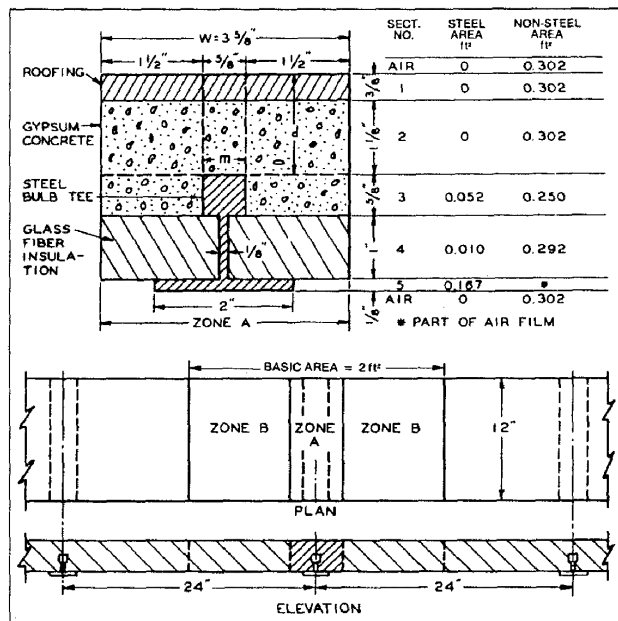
Gypsum Roof Deck on Bulb Tees (Example 4)
